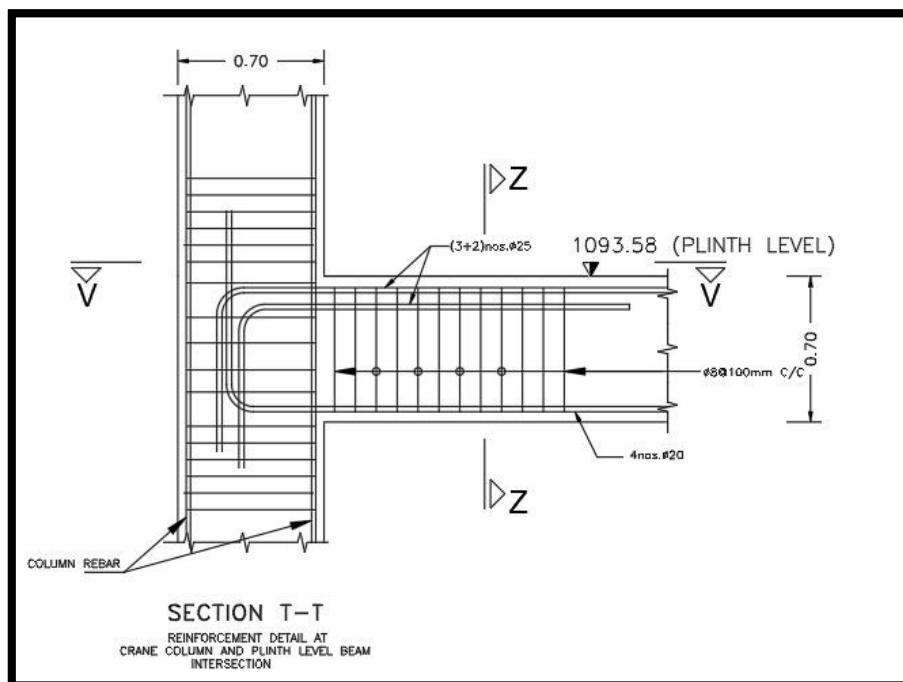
48 Section T-T of crane column and plinth level beam intersection
